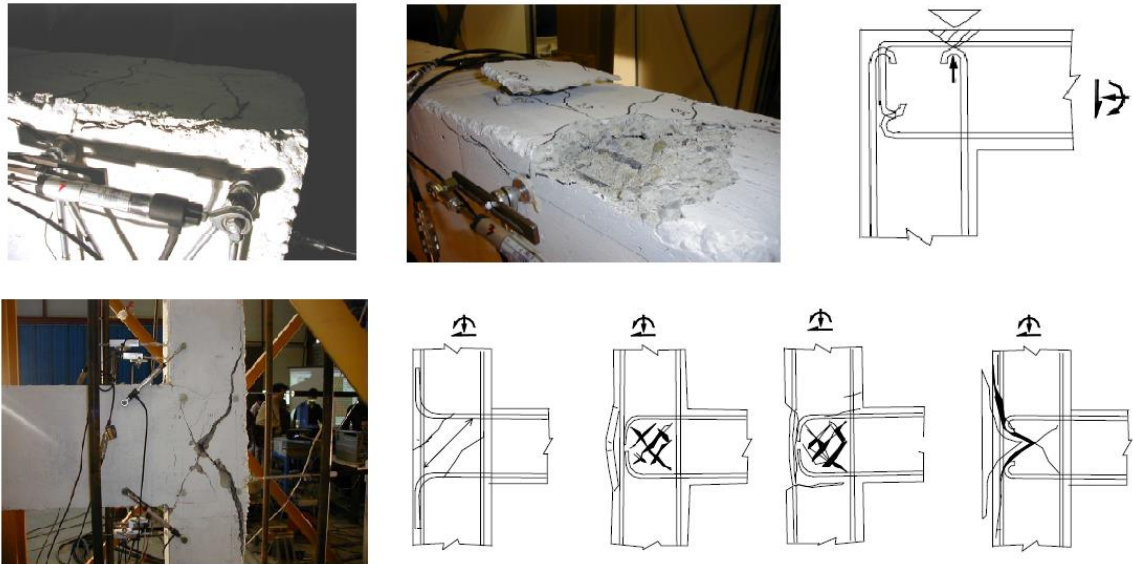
Knee and Tee joint failure mechanisms [Pampanin, Calvi et al. 2002]
